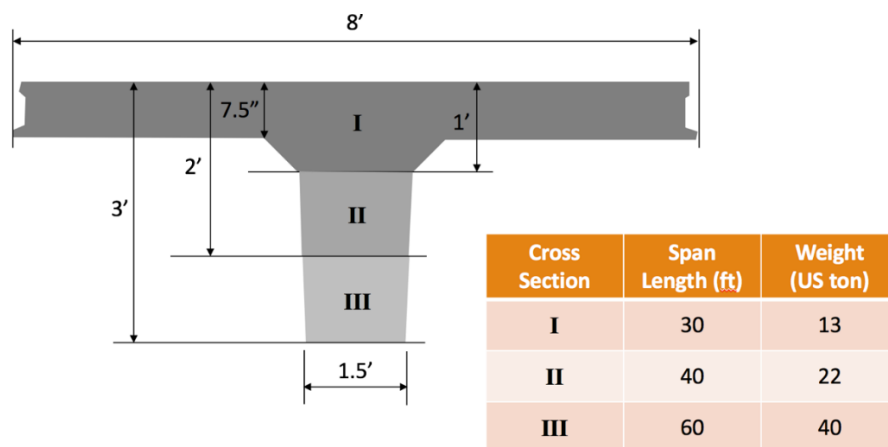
Proposed Standardized “Flexible” Cross Section for Nebraska County Bridges
